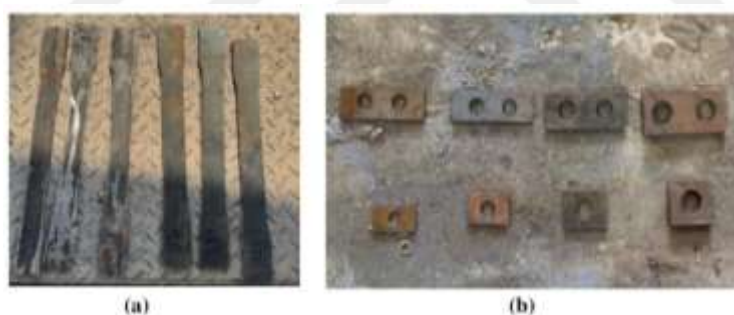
Site Reinforcement BRC Installation Above the Specimen. (a) Sampling of the Steel Plate, (b) Perfobond Lesite Samples
